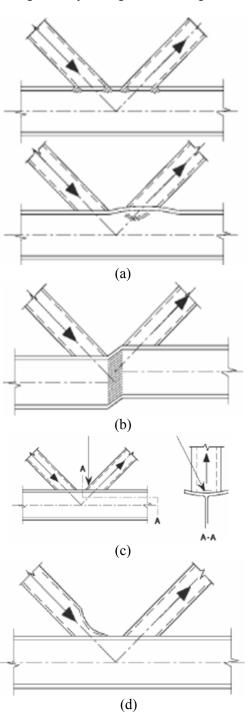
Failure modes of the joints for truss beams with RHS/CHS diagonals and I or H chord profile type.
